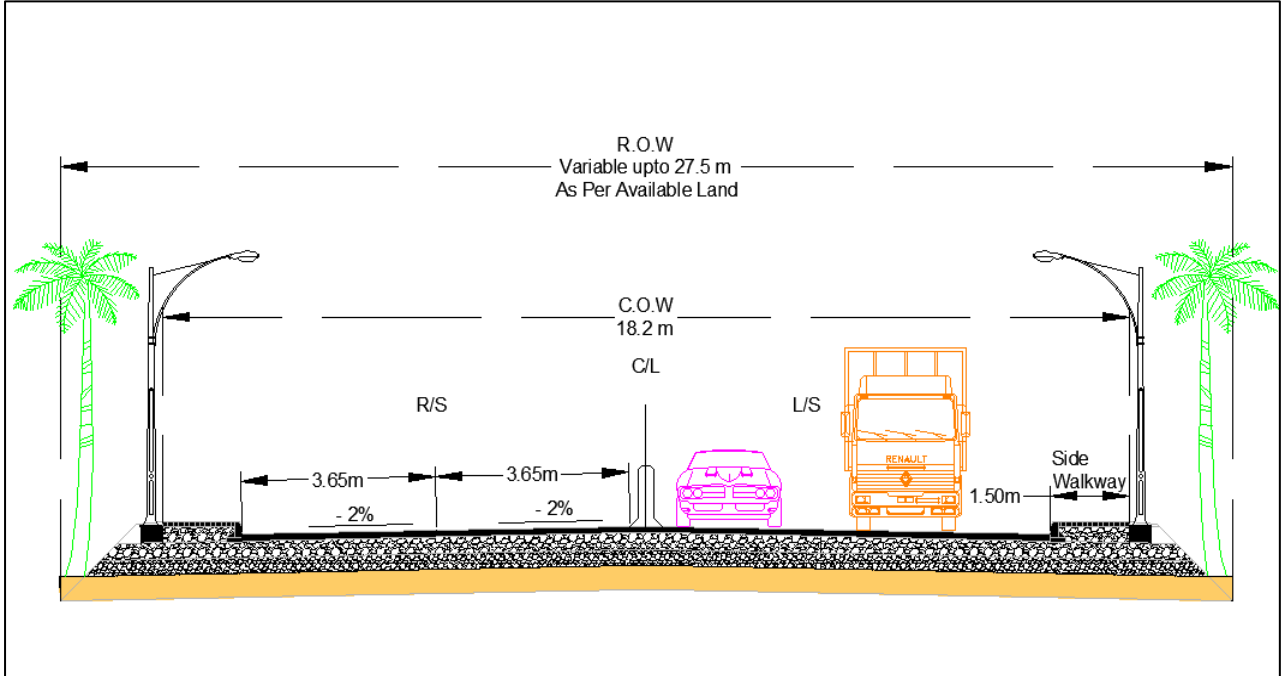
Proposed Typical Section of Urban Dual Carriageway
